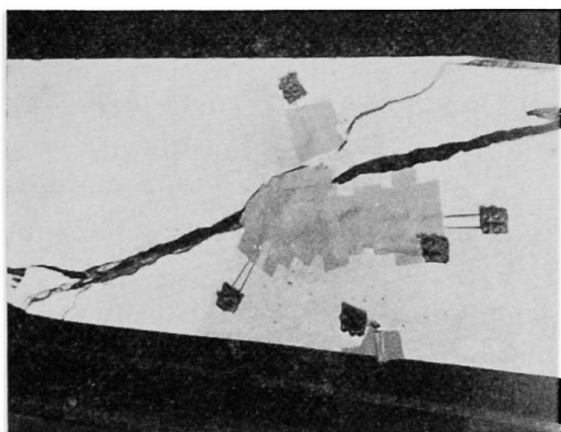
Cleavage fracture of a prestressed concrete hollow beam subjected to equal bending and twisting moments.
